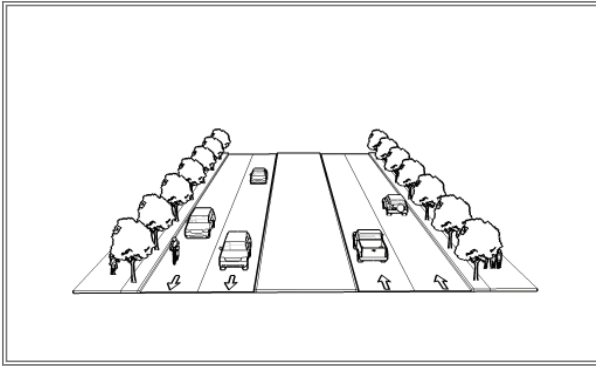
AASHTO recommended placement of trees between sidewalk and travel lanes.
